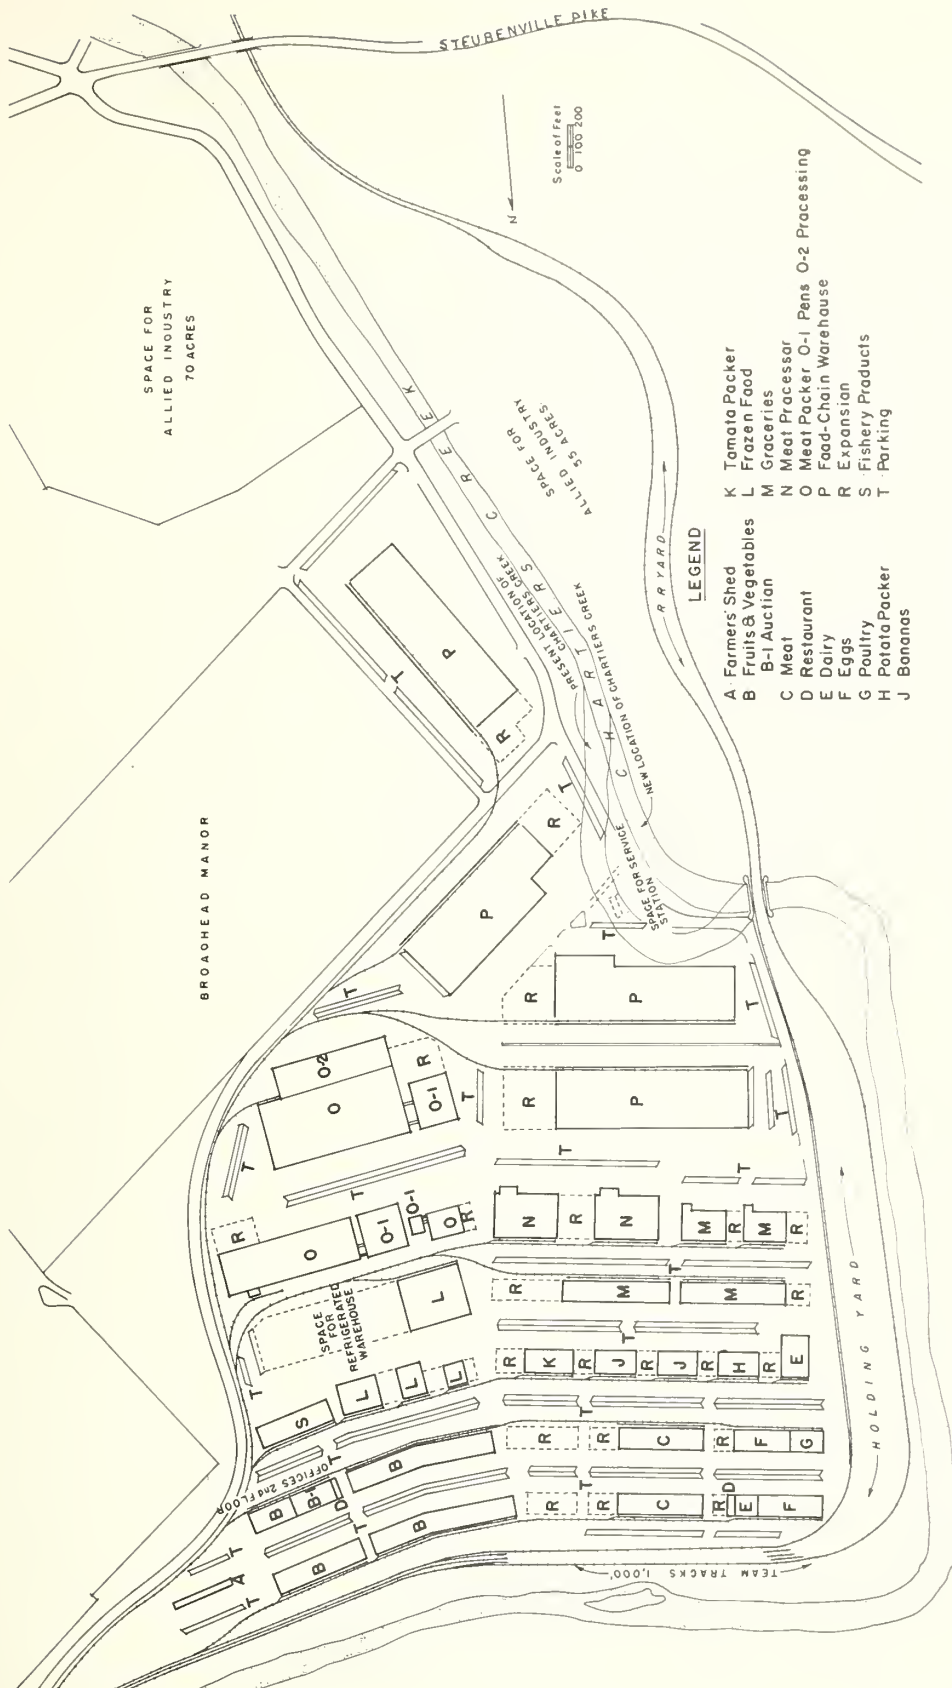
Arrangement of proposed facilities on the Chartiers site.
